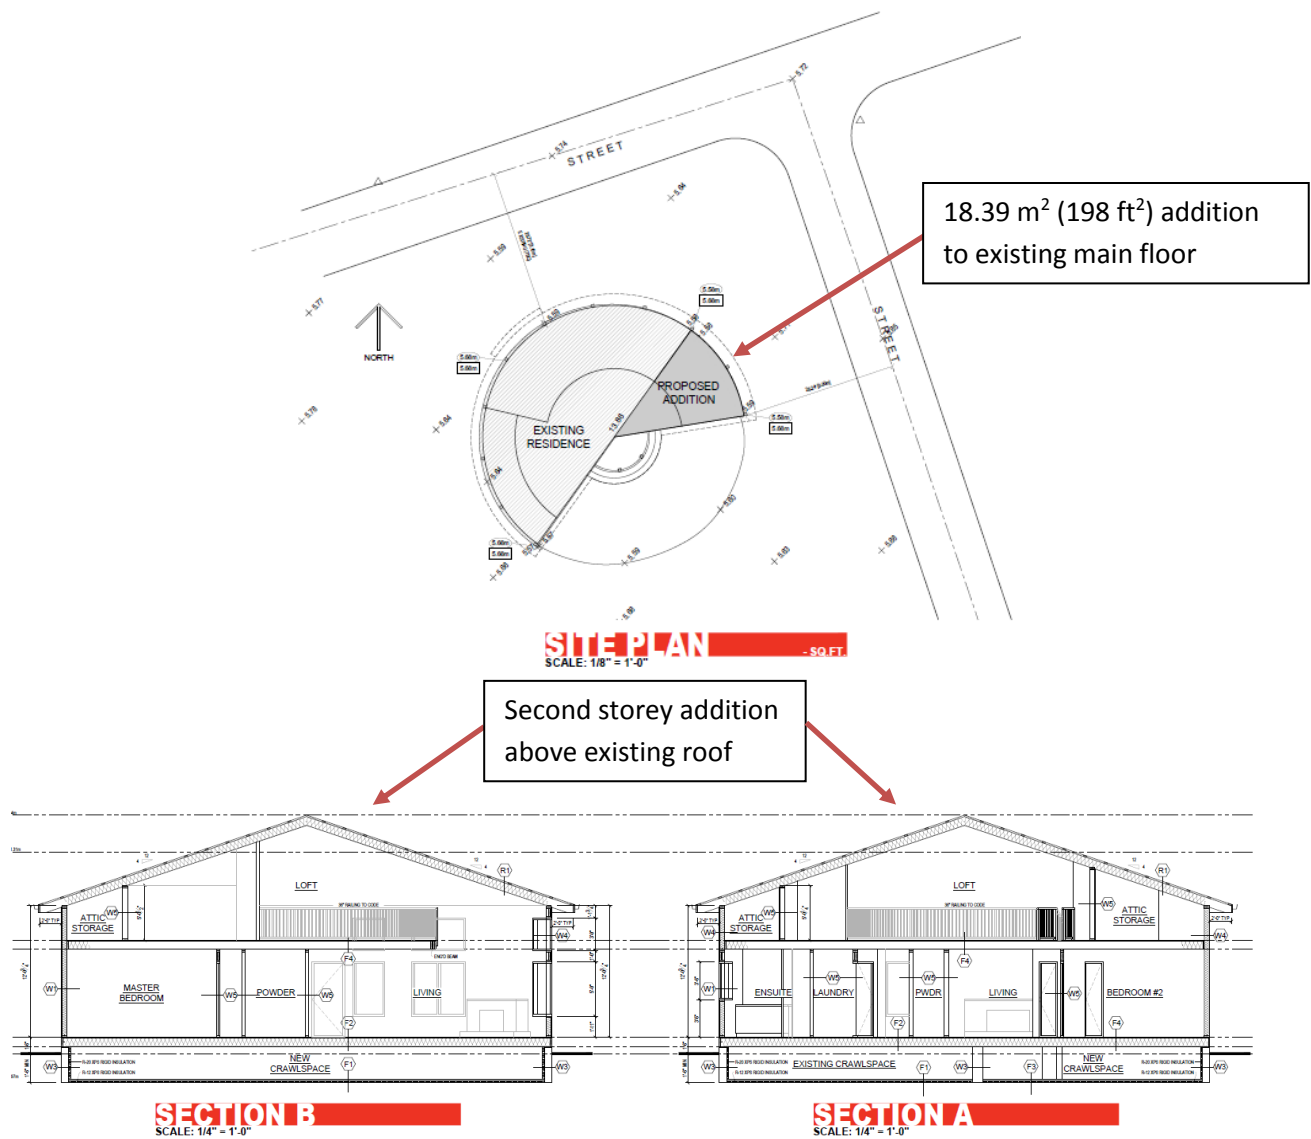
Excerpt from submitted site plans of proposed structural alterations.
